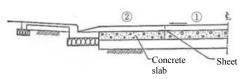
Order of paving work on sheets placed across two lanes¹⁸⁾
